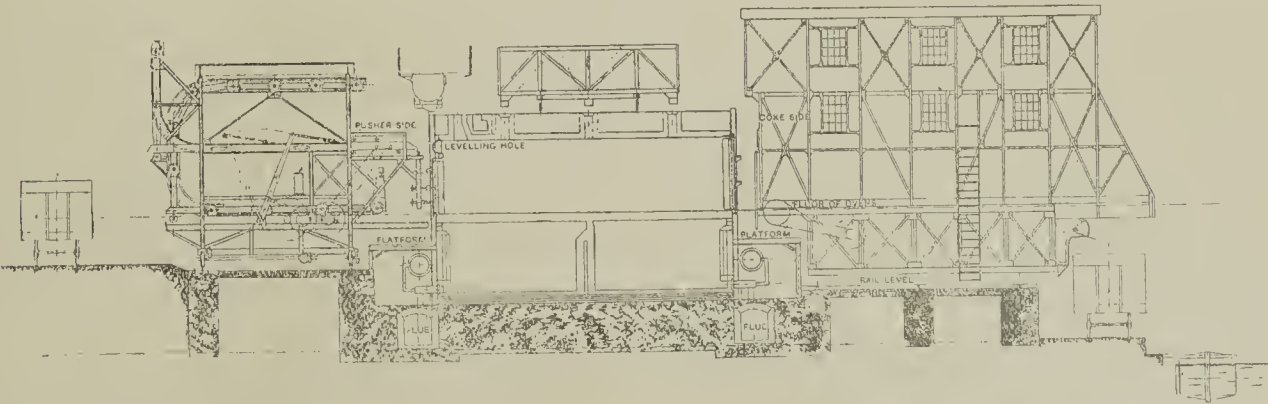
SECTION THROUGH OVEN, SHOWING DISCHARGING RAM, STAMPING MACHINE, AND HAND-CHARGING LORRY.
